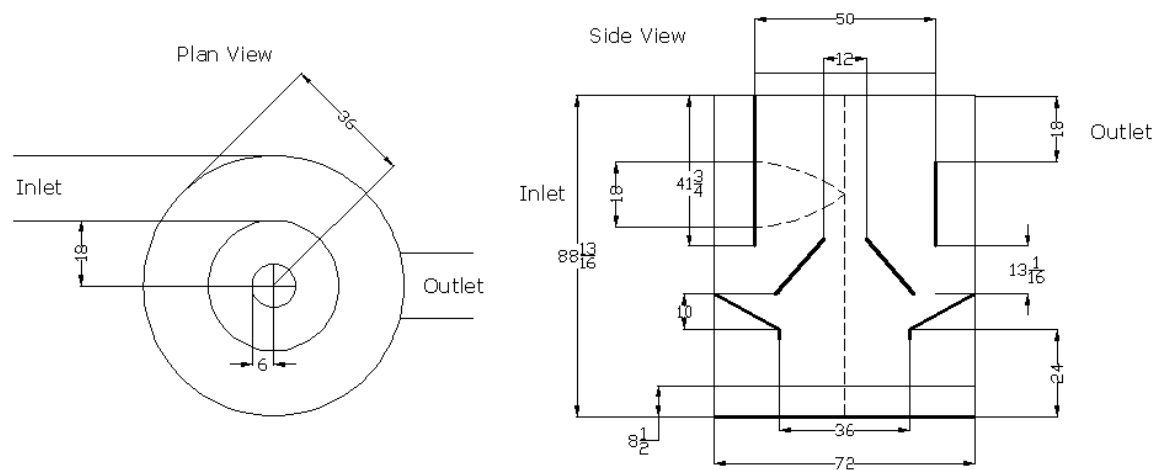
Dimensions of different components of Downstream Defender (all dimensions are in inches).
